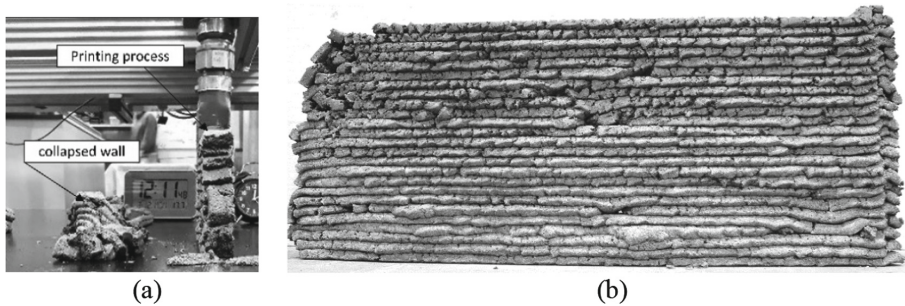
3D printing of the foam concrete M-A1: (a) collapsed wall with TI of 2 min and upright standing wall being printed with TI of 5 min TI ; (b) foam concrete wall specimen printed with TI of 5 min.
